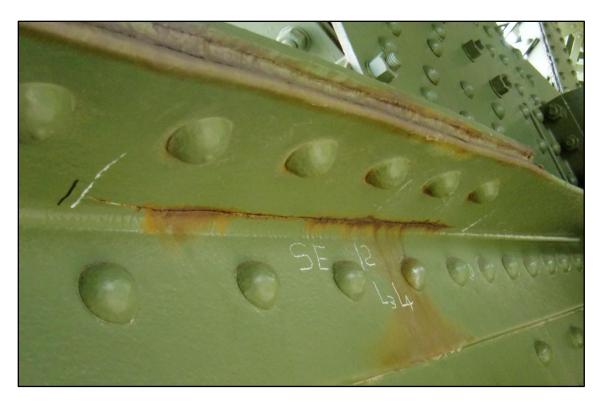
Stress Corrosion Crack, Top North Flange Angle, SE  $L_3L_4$ , Span 12.
